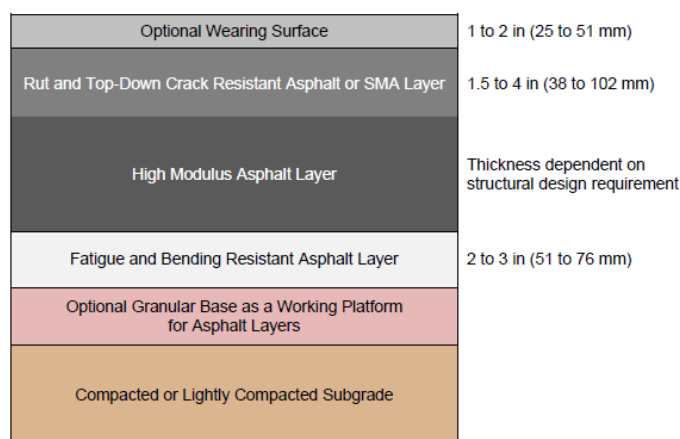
Perpetual pavement cross-section (Not to scale) (T. J. Van Dam et al., 2015, p. 4.11)
